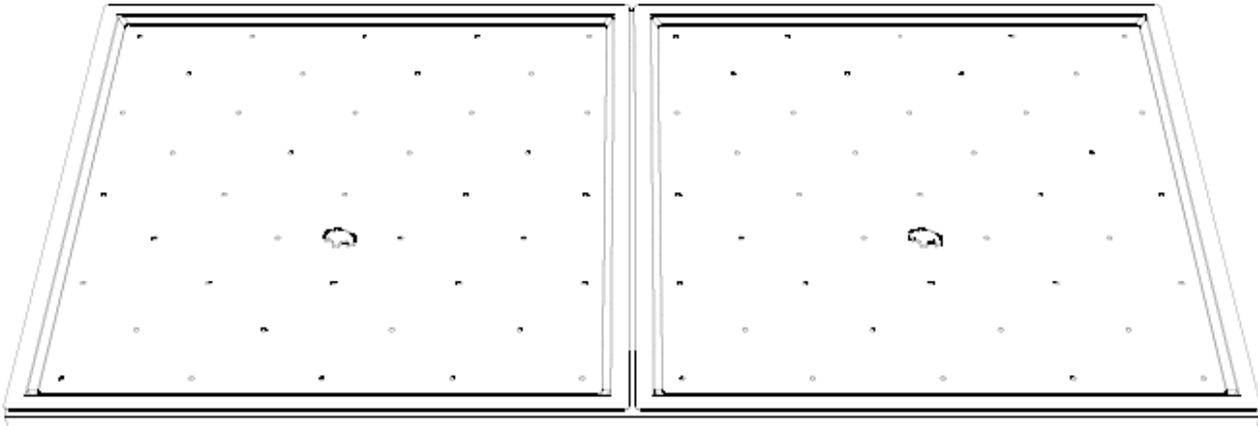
BISON WOOD TILE / FS-12 DETAILS
